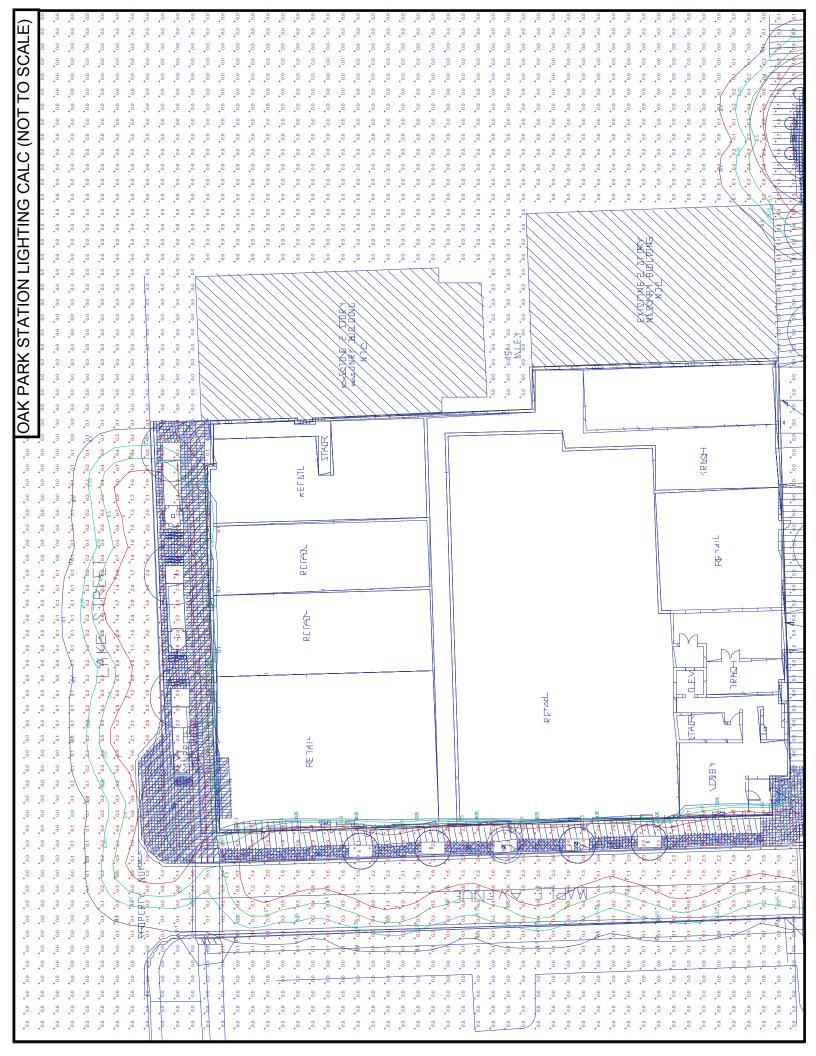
EXTERIOR LIGHTING PLAN
